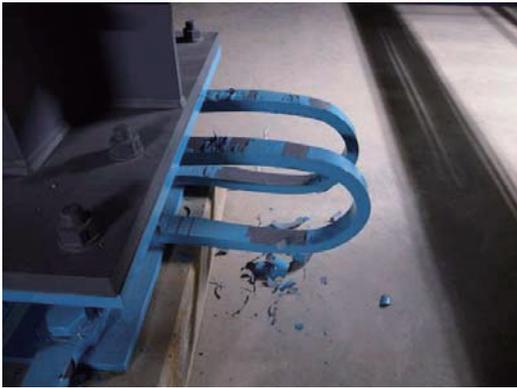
Peeling off of paint and loose of the bolts of U-shaped steel dampers
